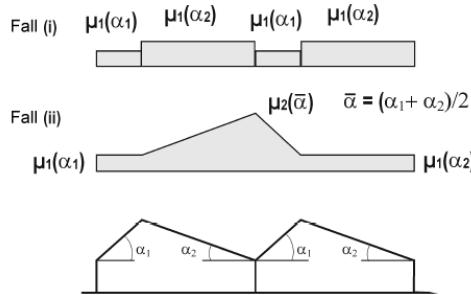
Snow Loading Arrangement for Saw-Tooth Roofs taken from DIN EN 1991-1-3 Bild 5.4
